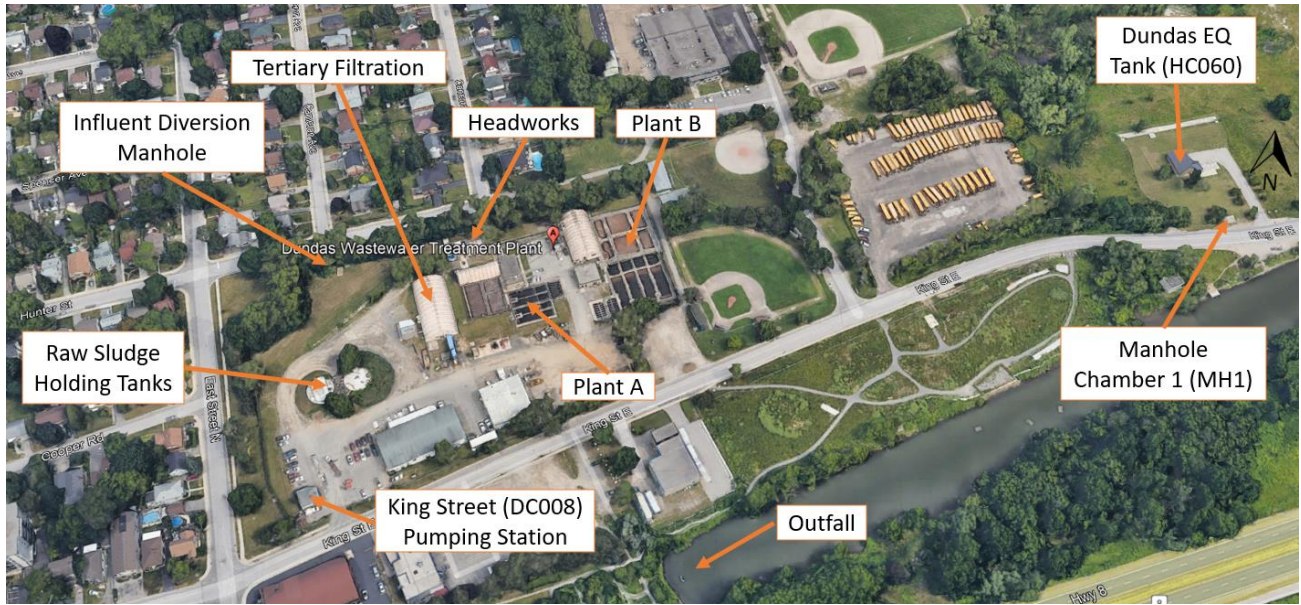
Existing Location and Site Plan of Dundas WWTP
